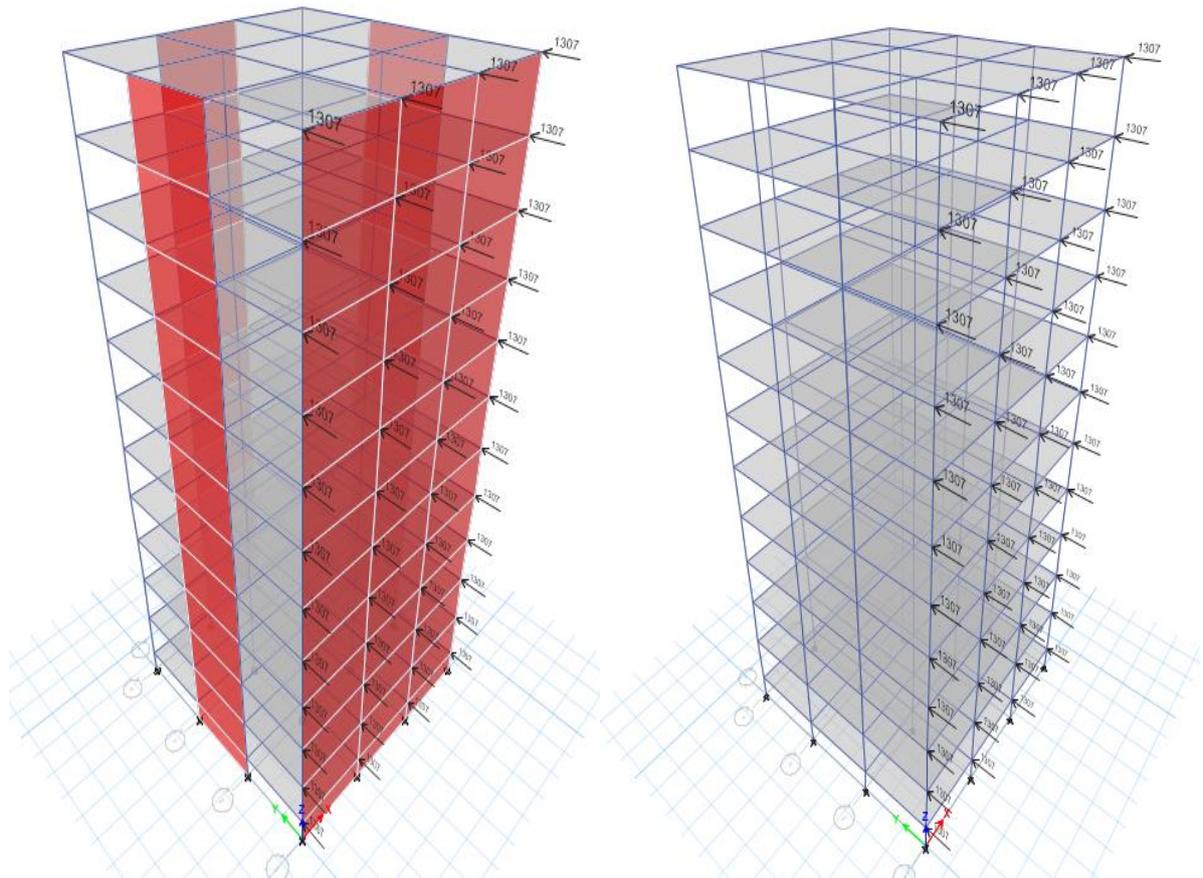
Blast load application on beam column joints of Steel concrete composite structure and RCC structure.
